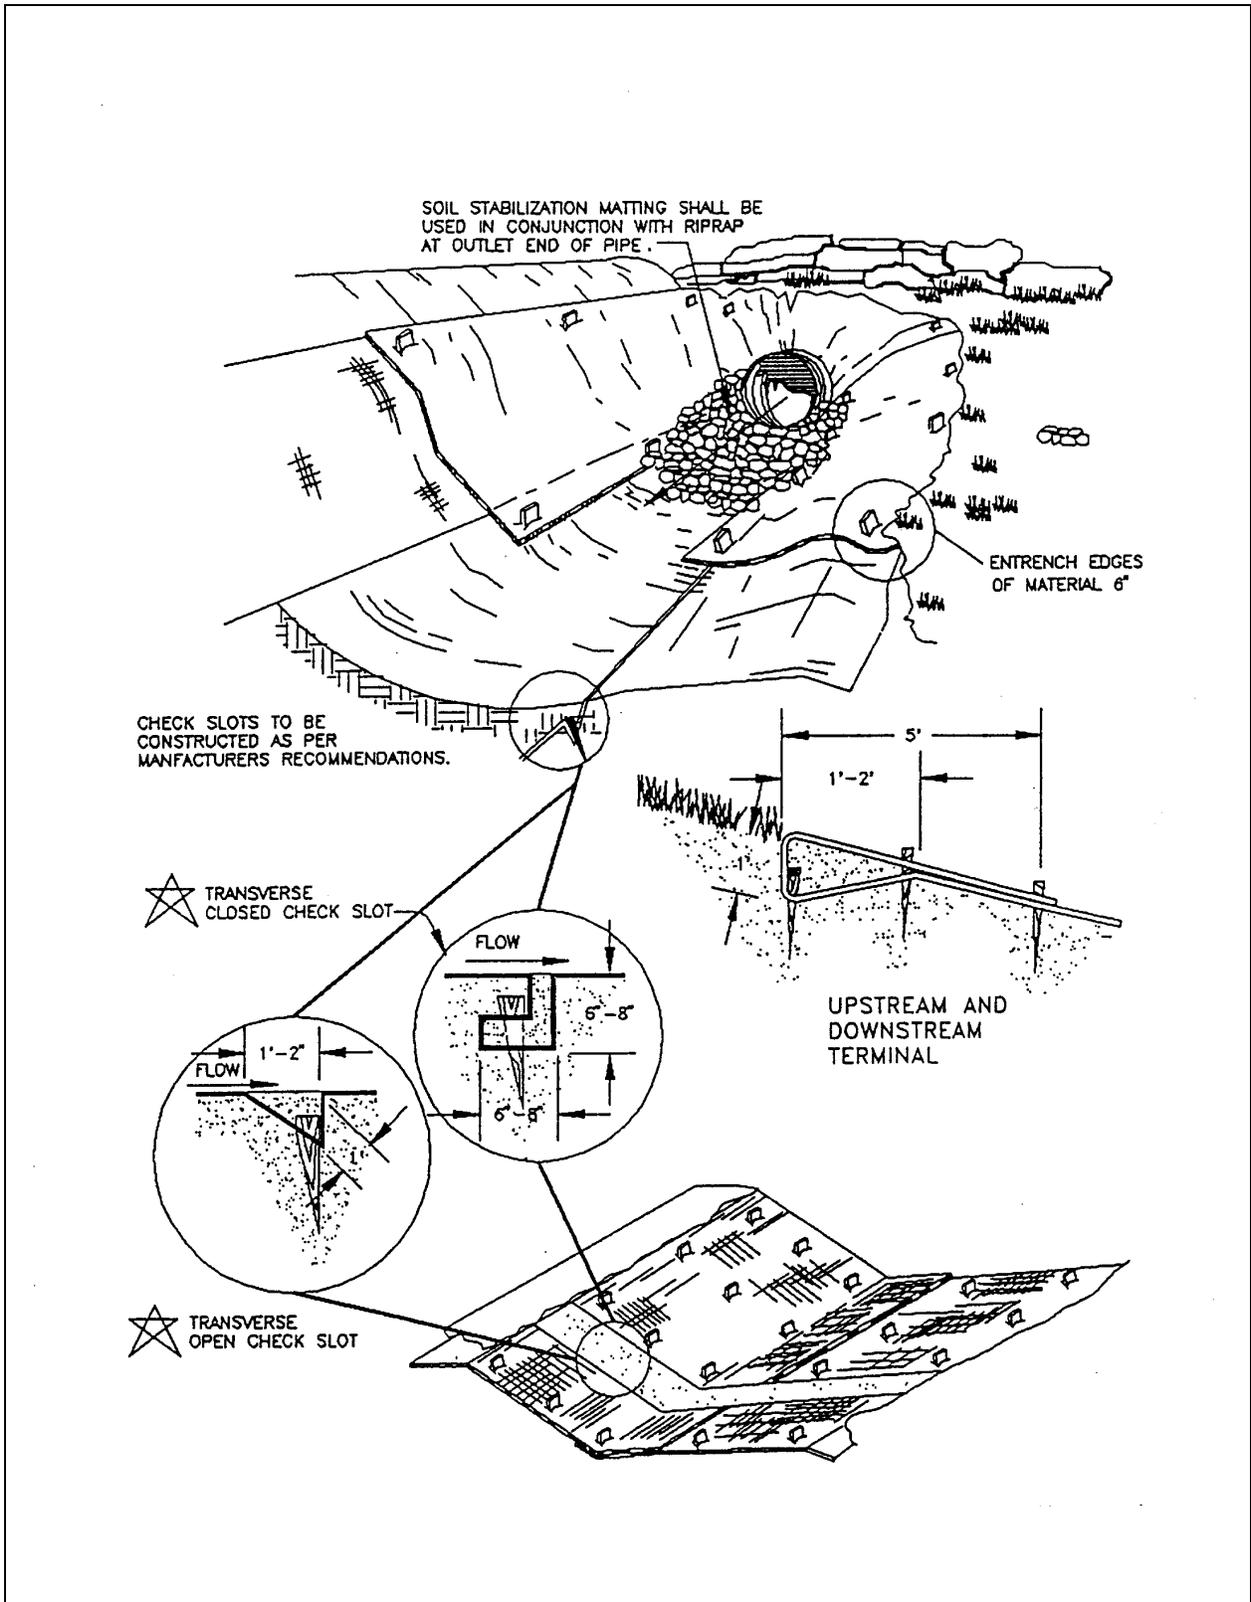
Typical Treatment 2 - Soil Stabilization Matting Installation
